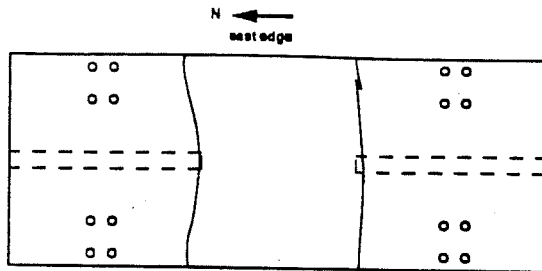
Sp. 2a: Progression of Cracking of Top Face of Roof Slab at Load Point 135
